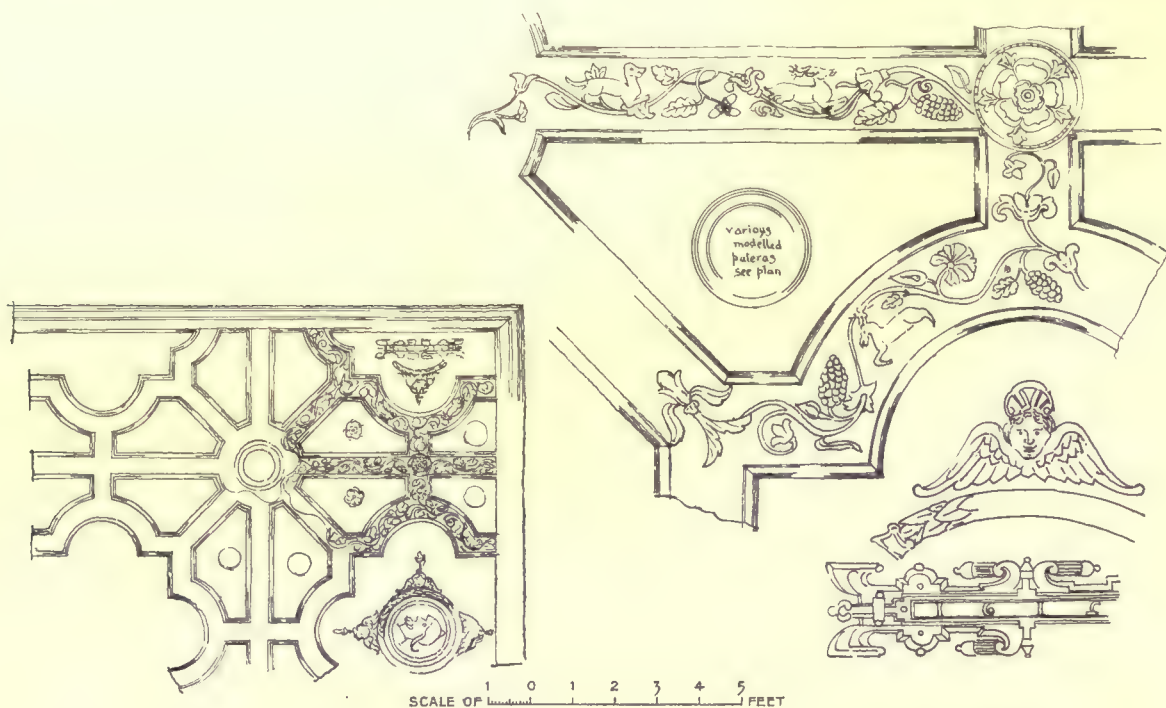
Ceiling of Oak Room in North Wing, Mapledurham House.
